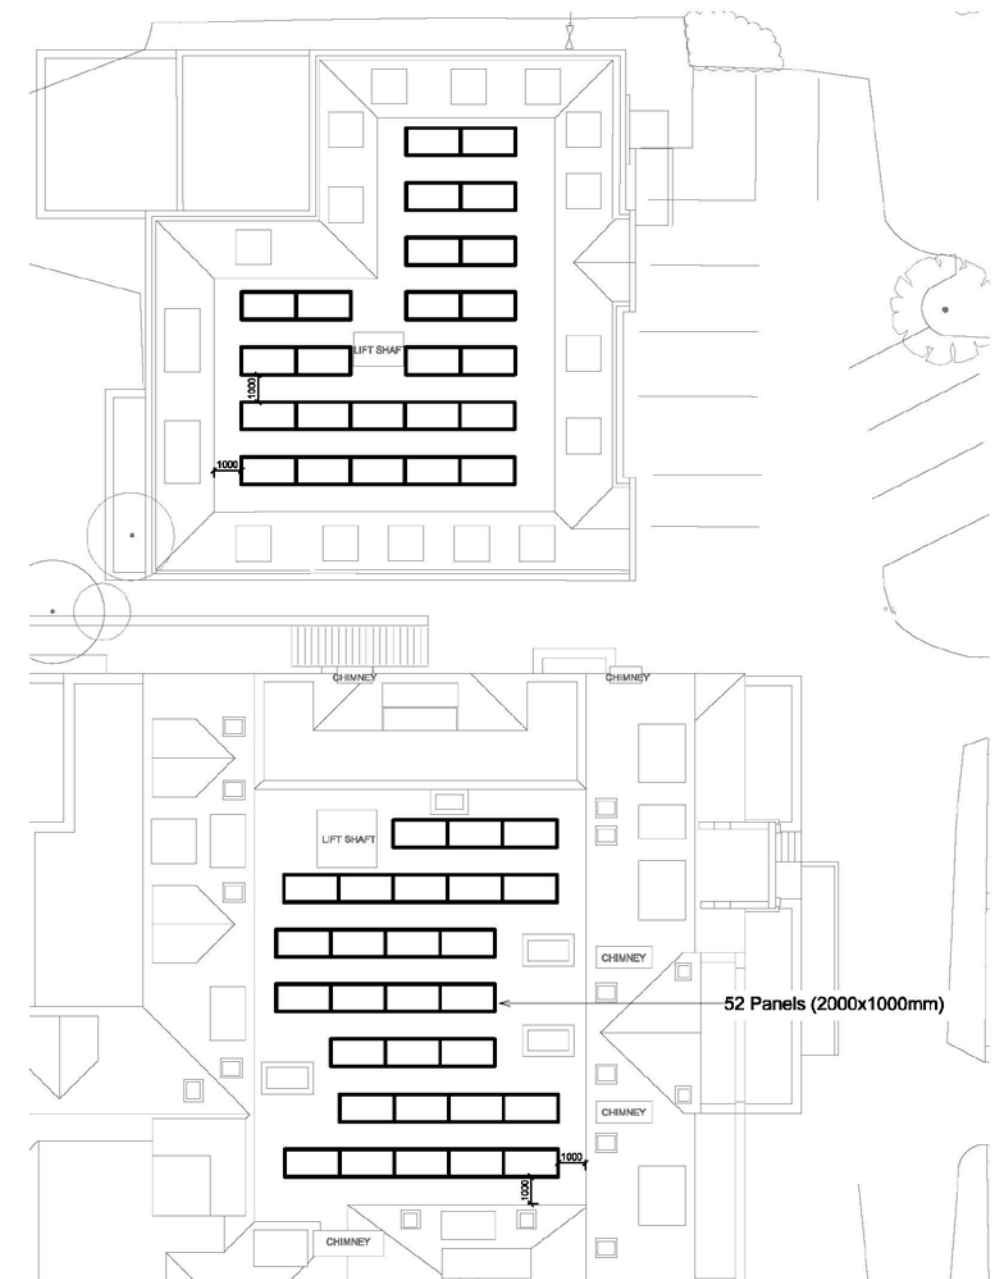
Roof layout showing proposed PV panels on the Roof (south facing)
